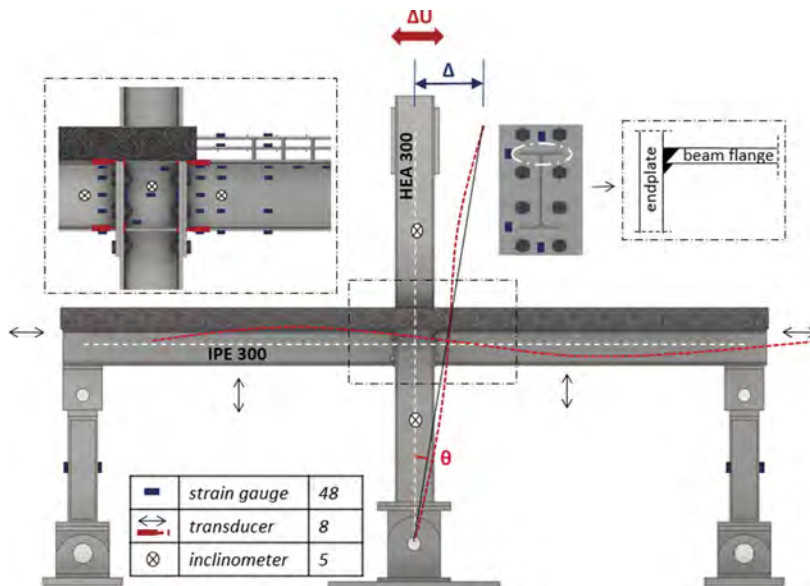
Measurement equipment, boundary conditions and type of beam-to-endplate welds.
